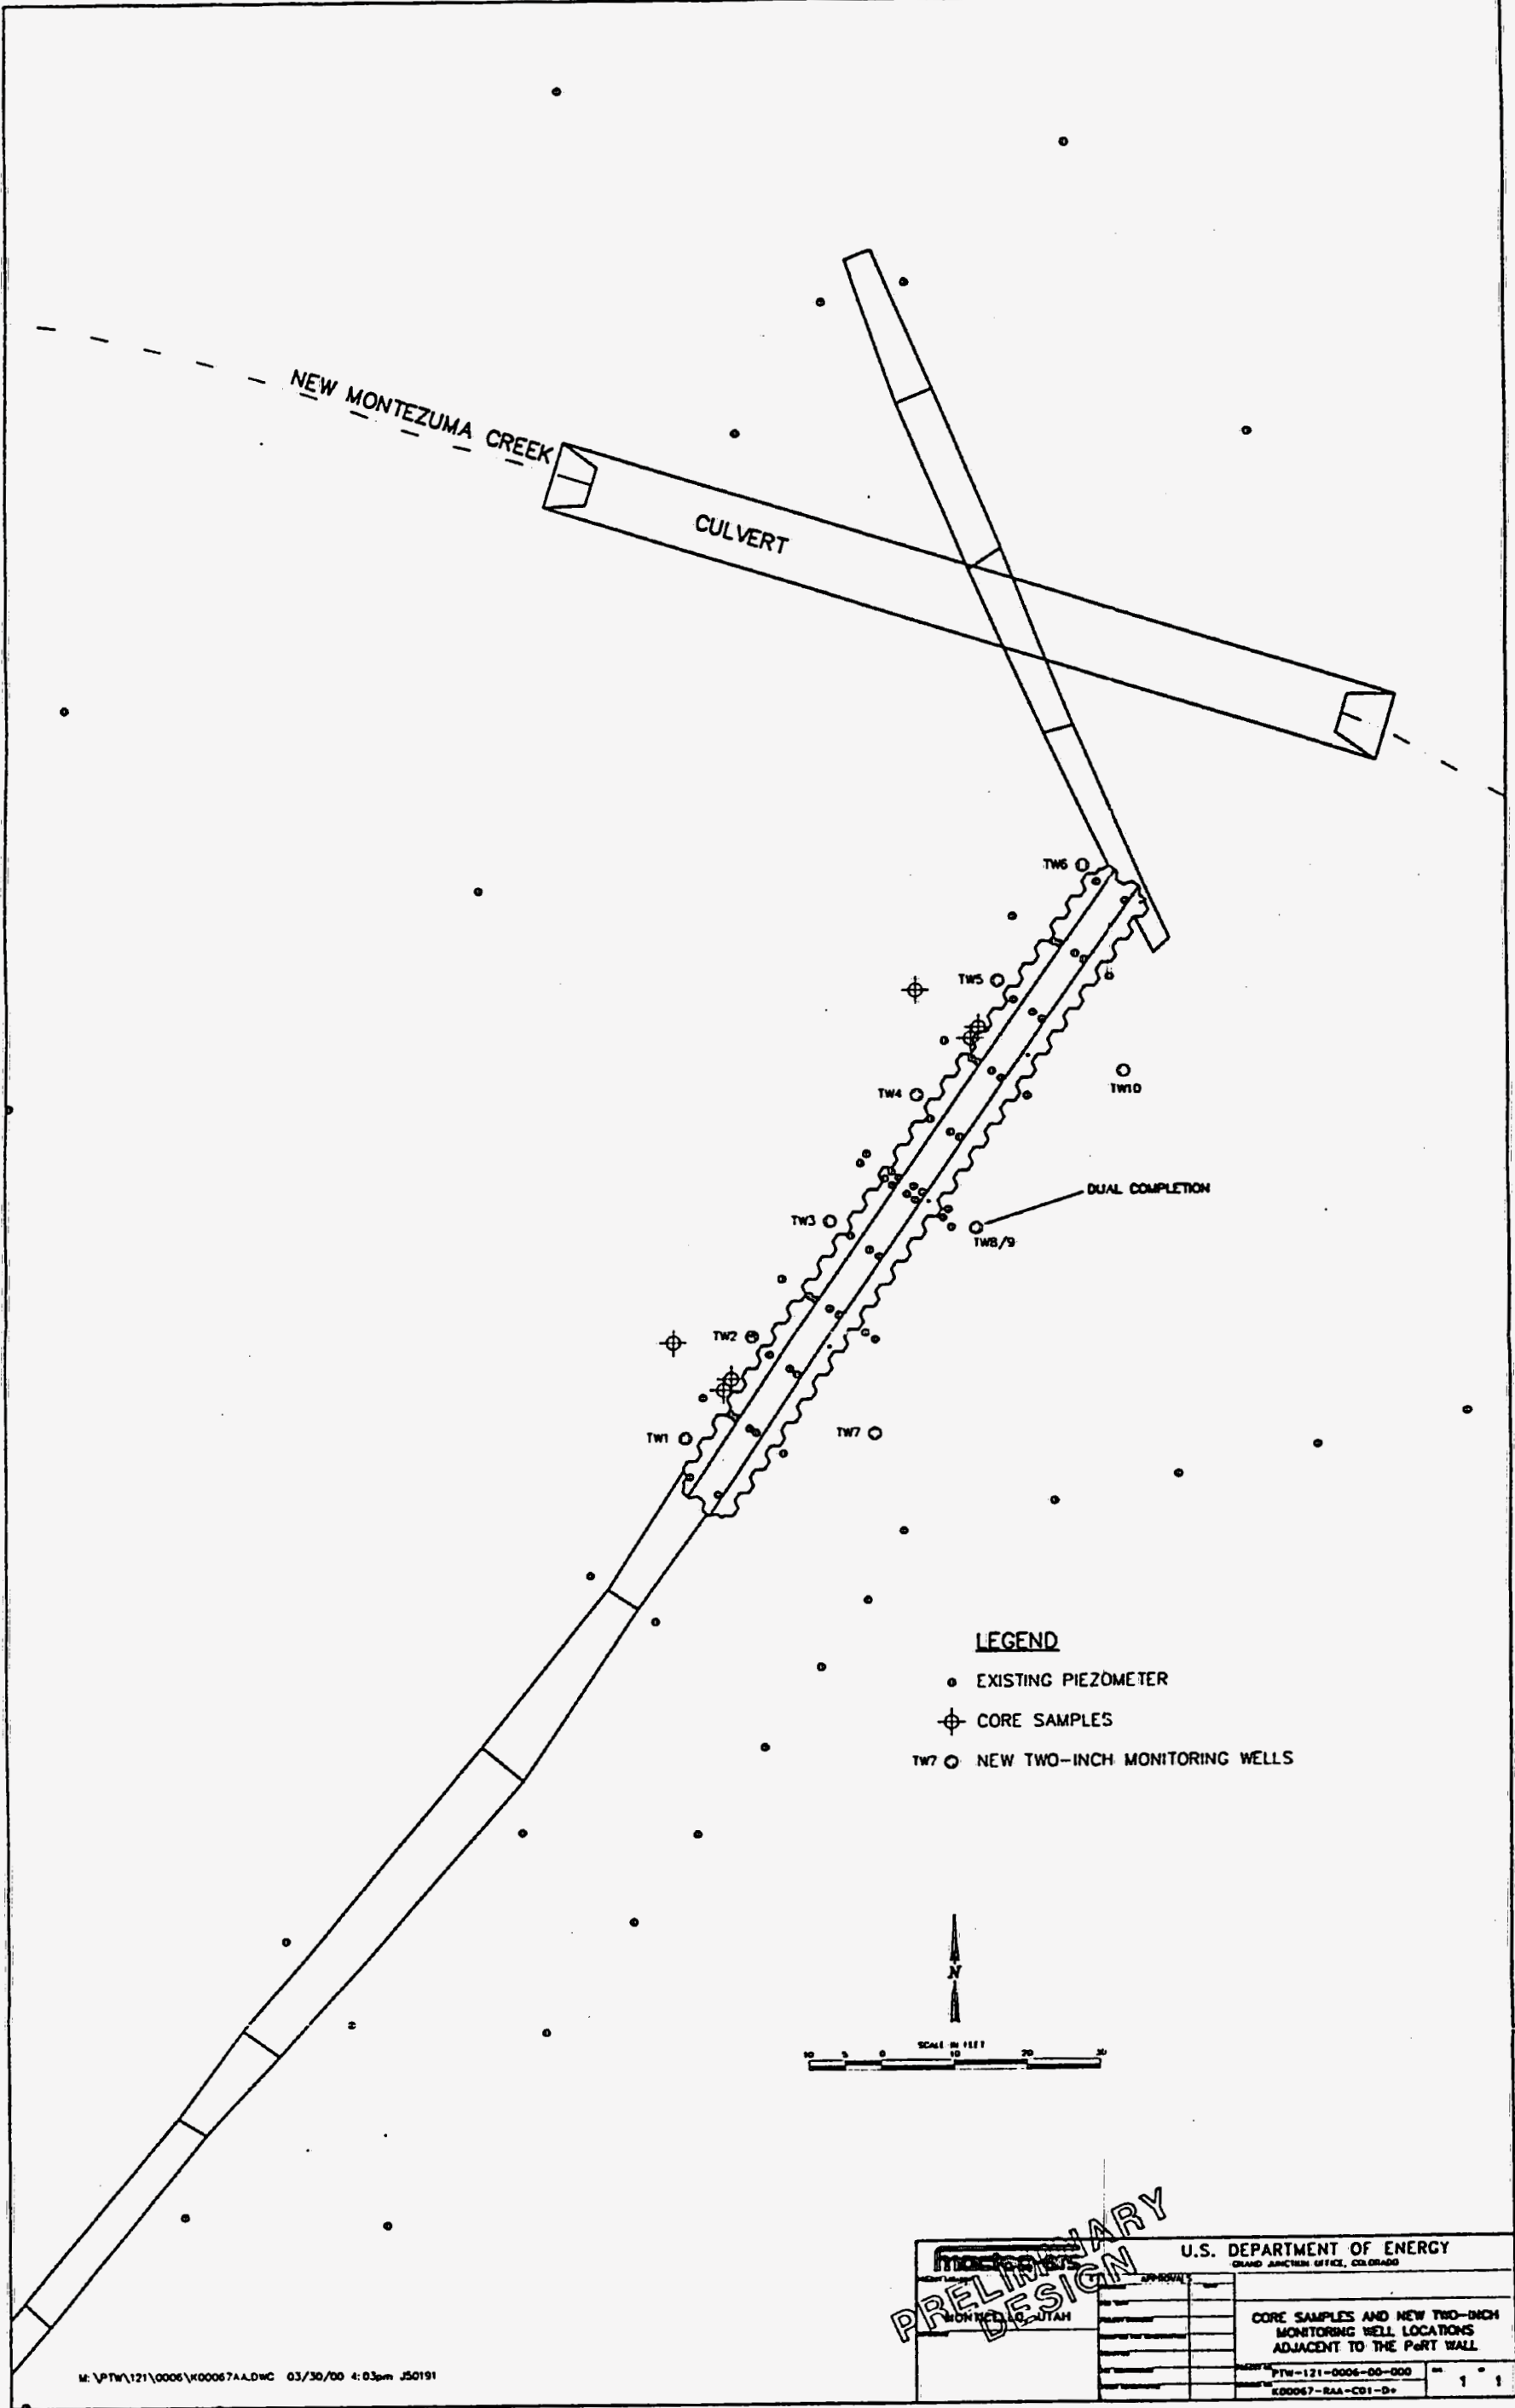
Core Samples and New Two-Inch Monitoring Well Locations Adjacent to the PeRT Wall
